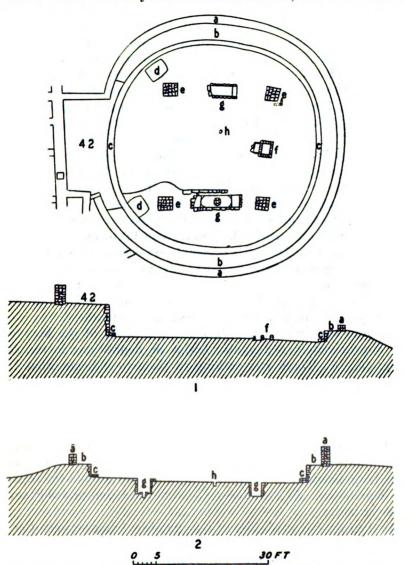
Plan and sections of Great Kiva No. 1. a, Outer walls; b, upper bench; c, lower bench; d, holes in floor; e, support pillars; f, fire pit; g, subfloor vaults; h, sipapu
